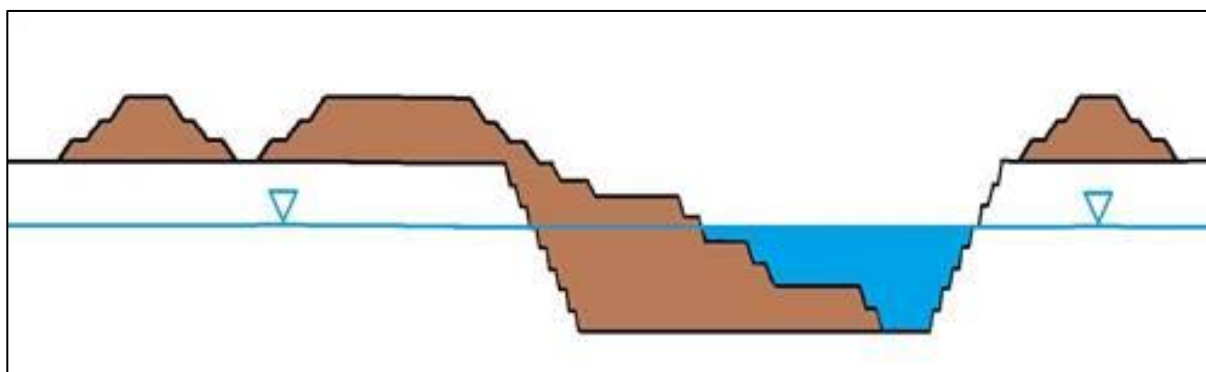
Backfill of the final pit void post mining to original ground level as per the original EMPr requirements
